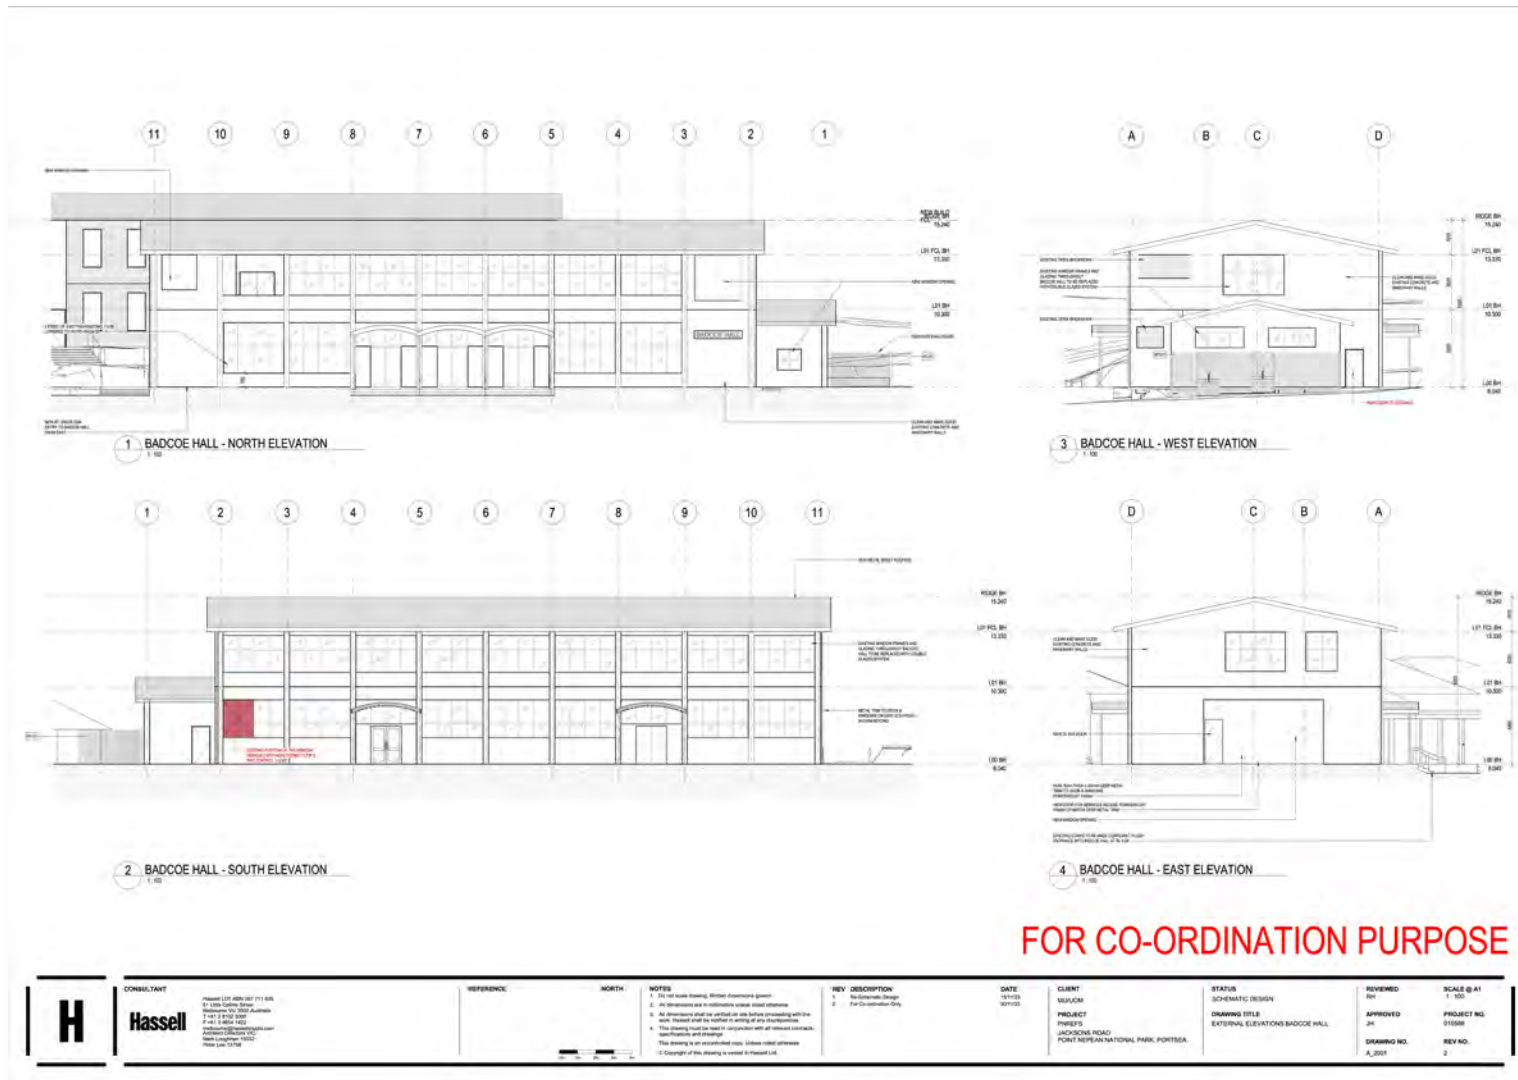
Development Plan Profile showing proposed adaptive reuse of Badcoe Hall. Document provided by UoM.
